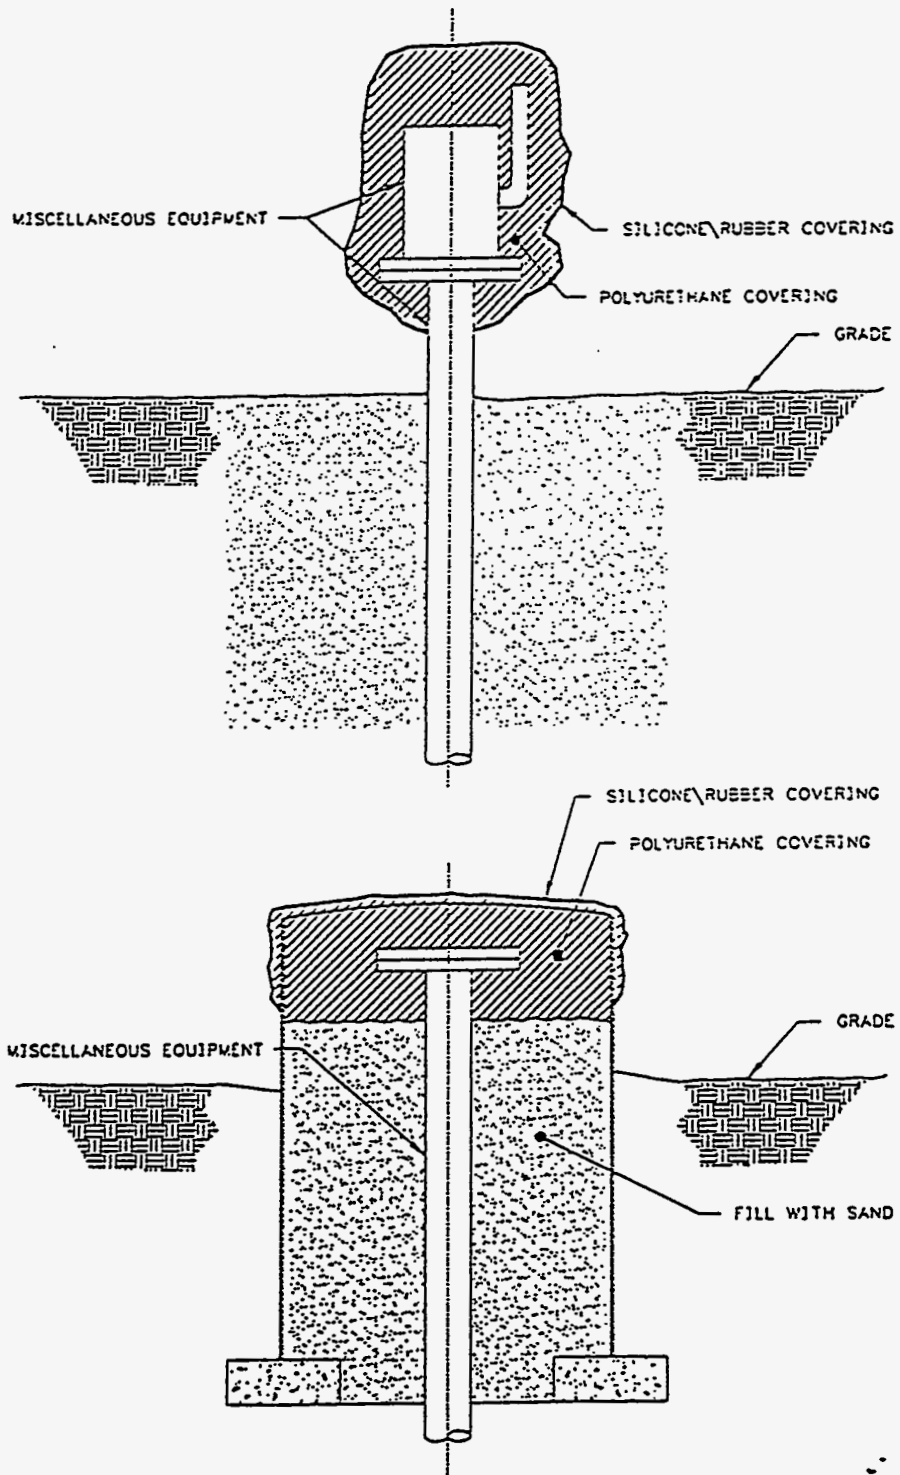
Typical Single-Shell Tank Isolation Details for Open Pipe Ends.
